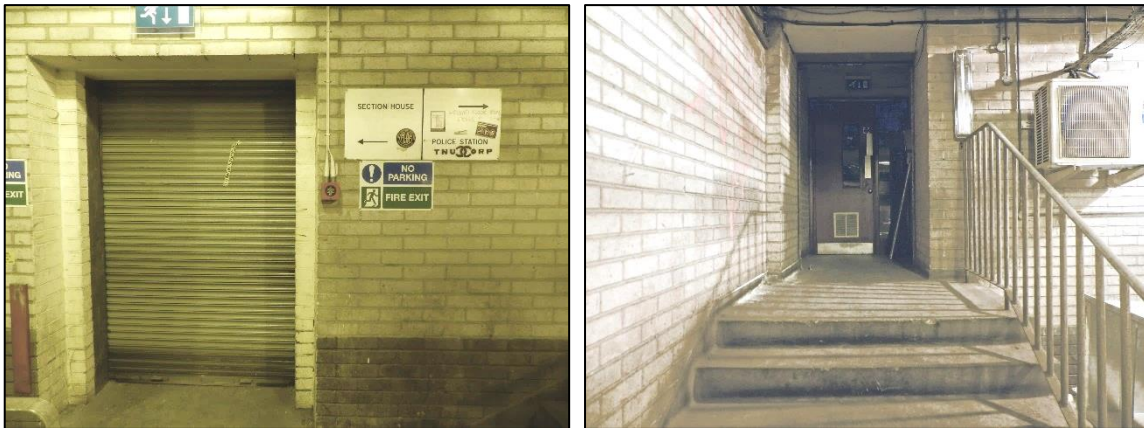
Access to the basement from the parking garage looking north-east (left) P1330292 and south-east P1330293 (right)
